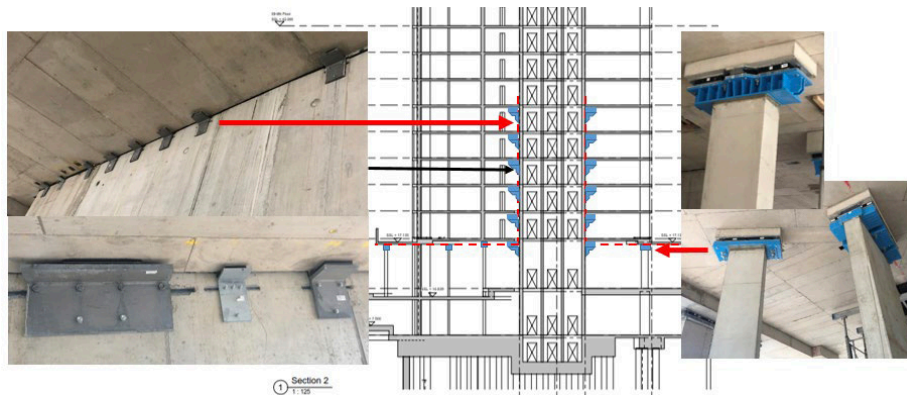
The final, as built solution adopted to isolate the first 6 floors of a 30 storey tower where the col-umns (effective length x1) where isolated at the underside of the first floor slab and the floor slabs of floors 1-6 were isolated from the non-isolated central core.
